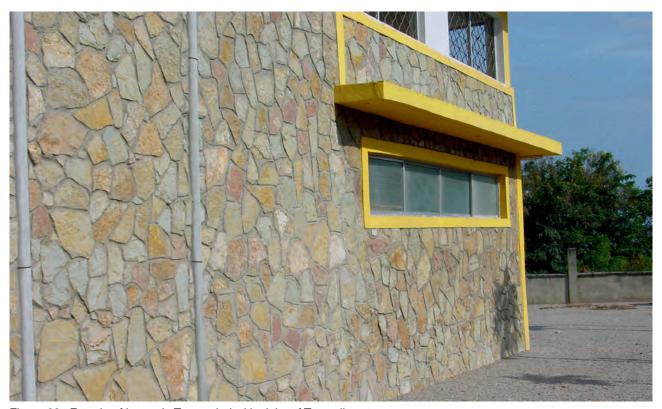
Facade of house in Tanga clad with slabs of Tanga limestone.
